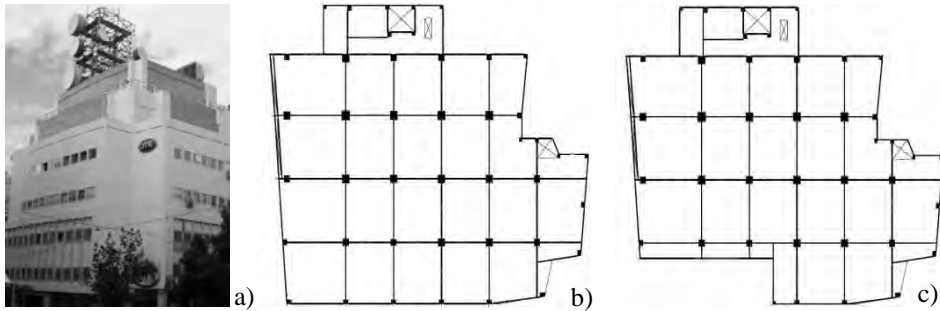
The Koletti building in Athens: external view of the building (a), plan view of the 1st and 2nd (b) and the 4th (c) floor.
